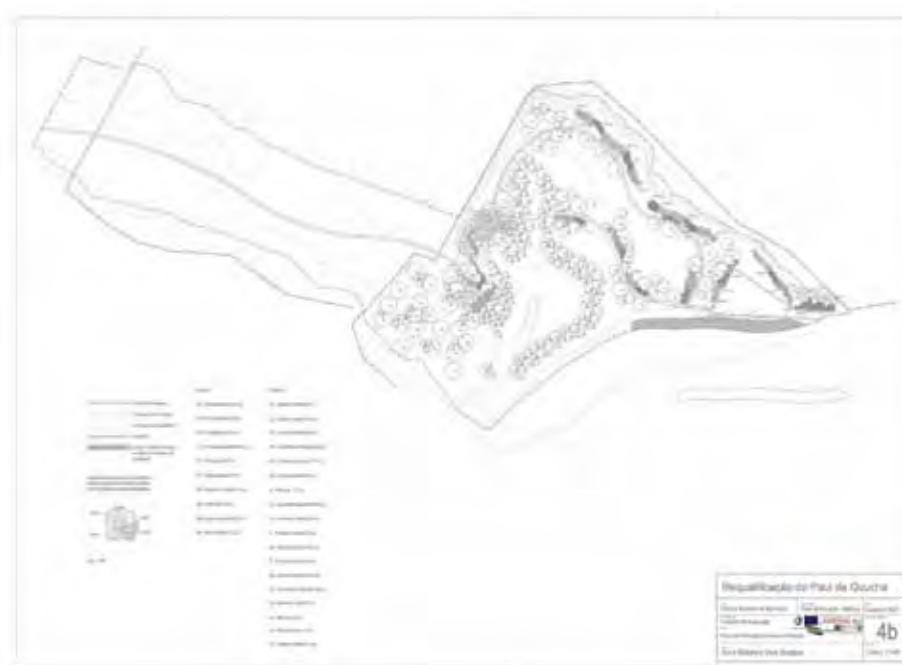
Planting plan for trees and shrubs in the works project.
